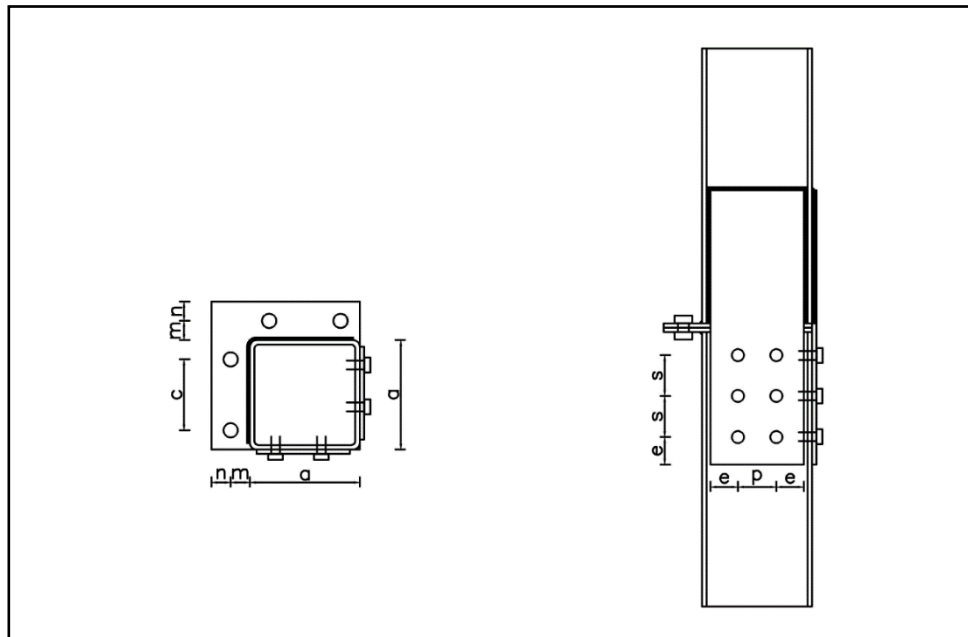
Plan and elevation of non-symmetrical corner splice connection
